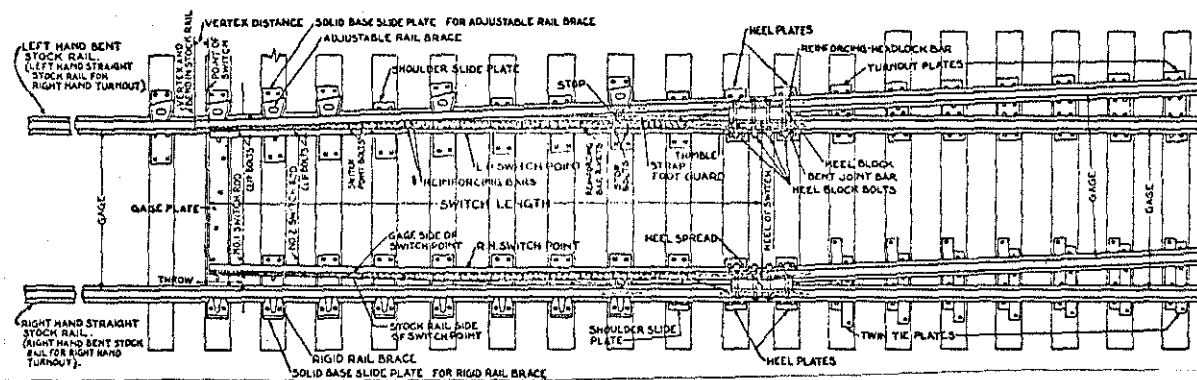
Plan View Indicating Various Parts of Switch Layouts
